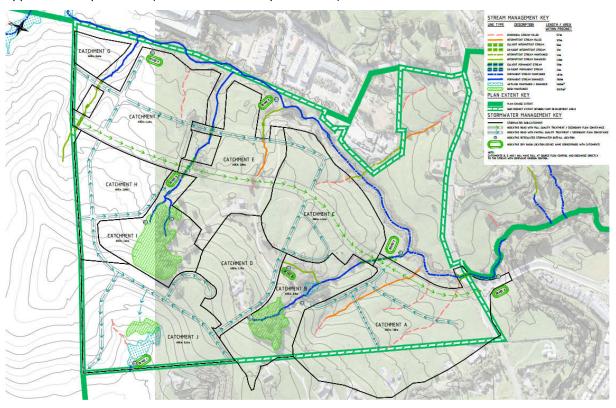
Stormwater Management Plan Example – Sub-precinct A – Stubbs Farm Development
